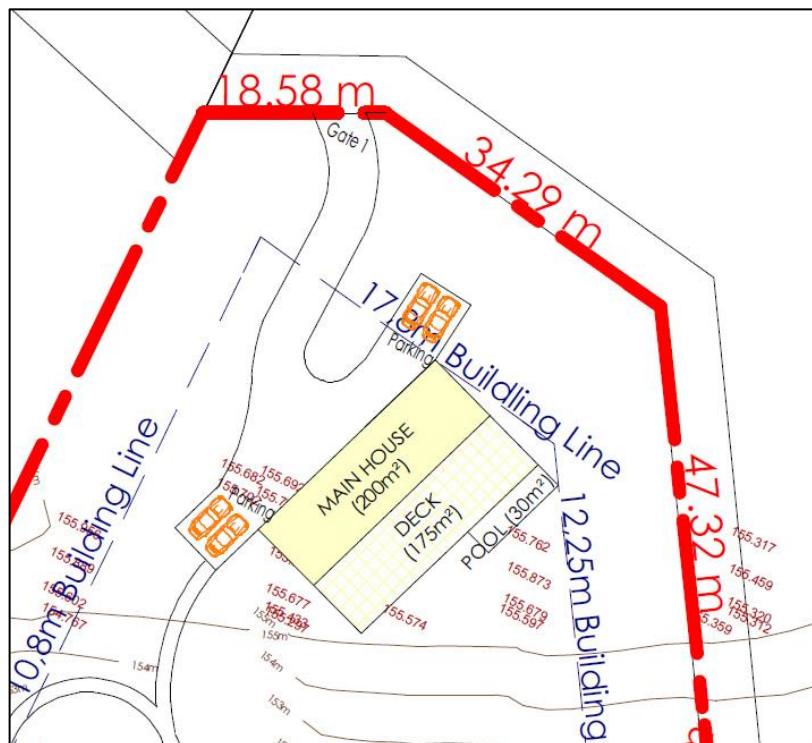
PARKING AREA #1 - SDP EXTRACT
